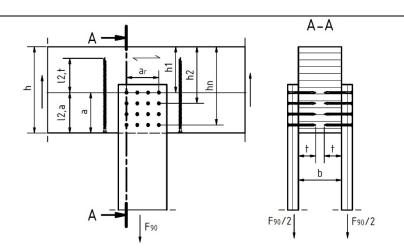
Reinforcement of transverse connections with Schmid screws
